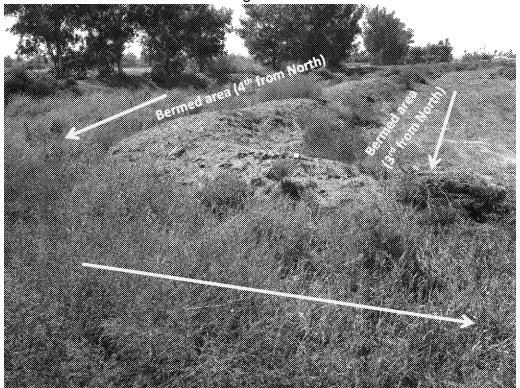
Ditch and berm along eastern edge of facility. View looking North.
